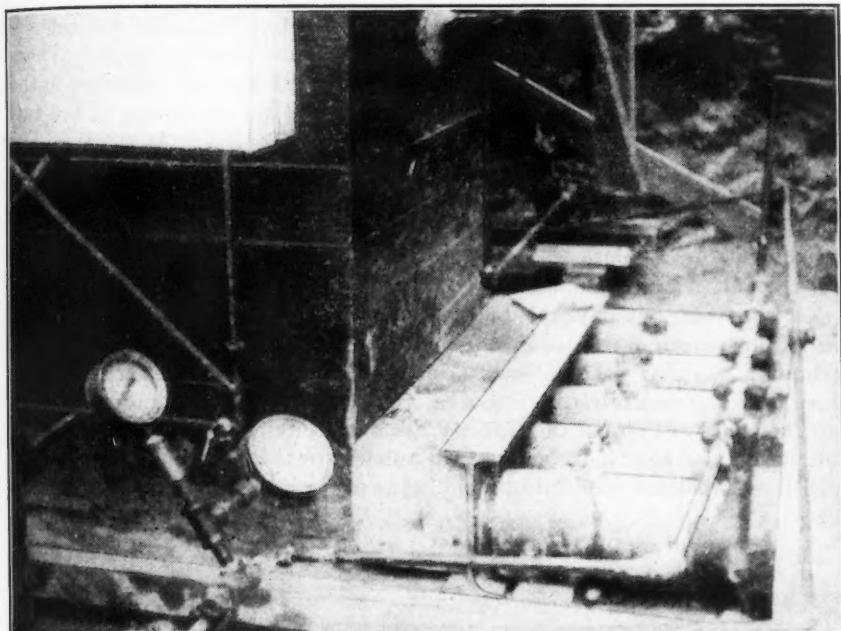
HYDRAULIC JACKS AND SHORING FOR HORIZONTAL LOAD APPLICATION
